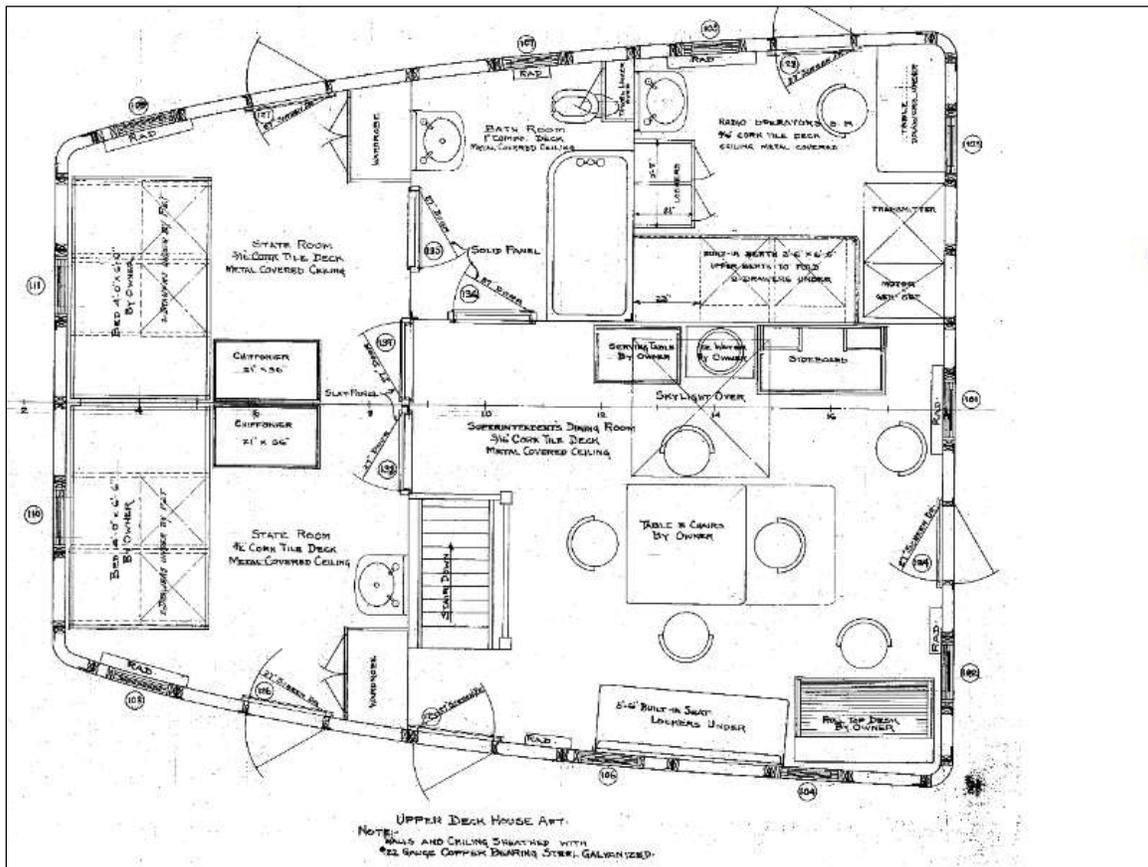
Aft deckhouse on *Lilac's* upper deck (USLS 1933).
